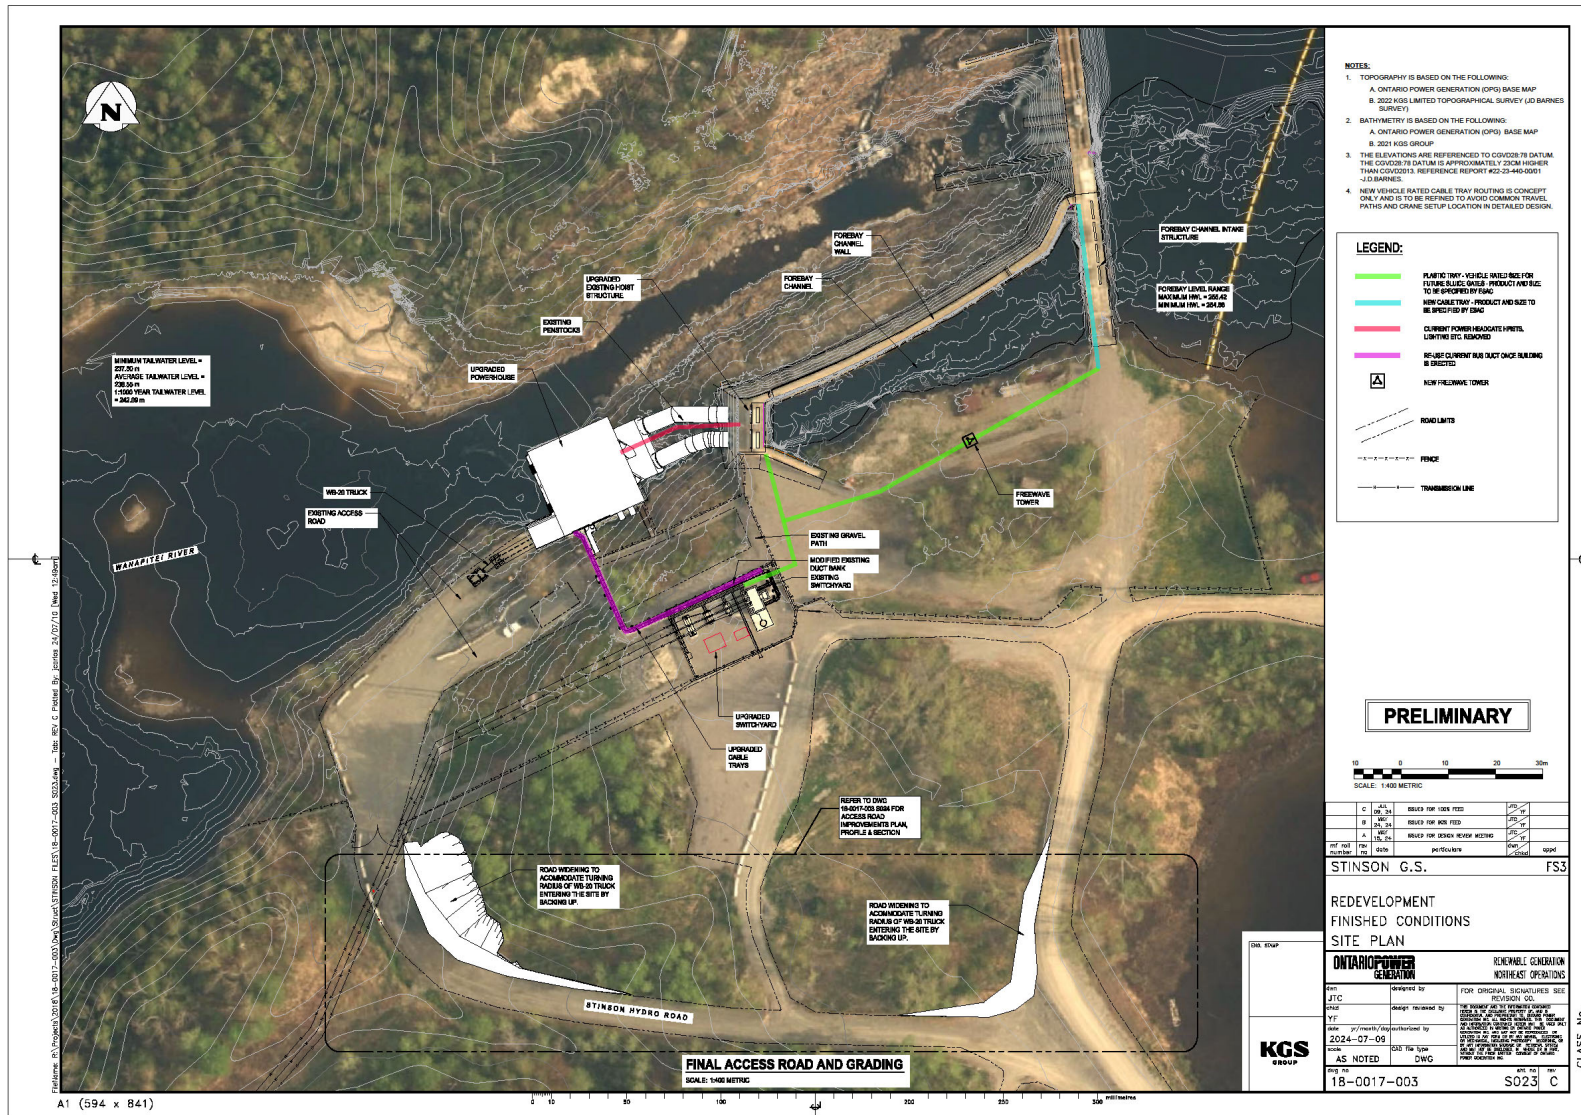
Proposed General Arrangement Site Plan for the Stinson GS
